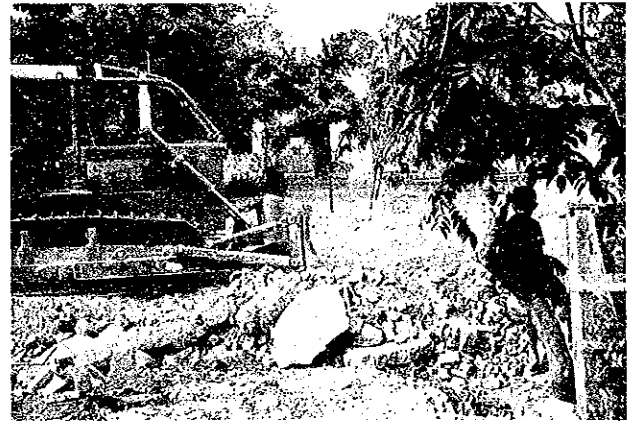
Military Staff Engaged in Demolishing and Recovery Works Two Weeks After the Earthquake, in Case of Masonry Structure, Demolishing is Easy
